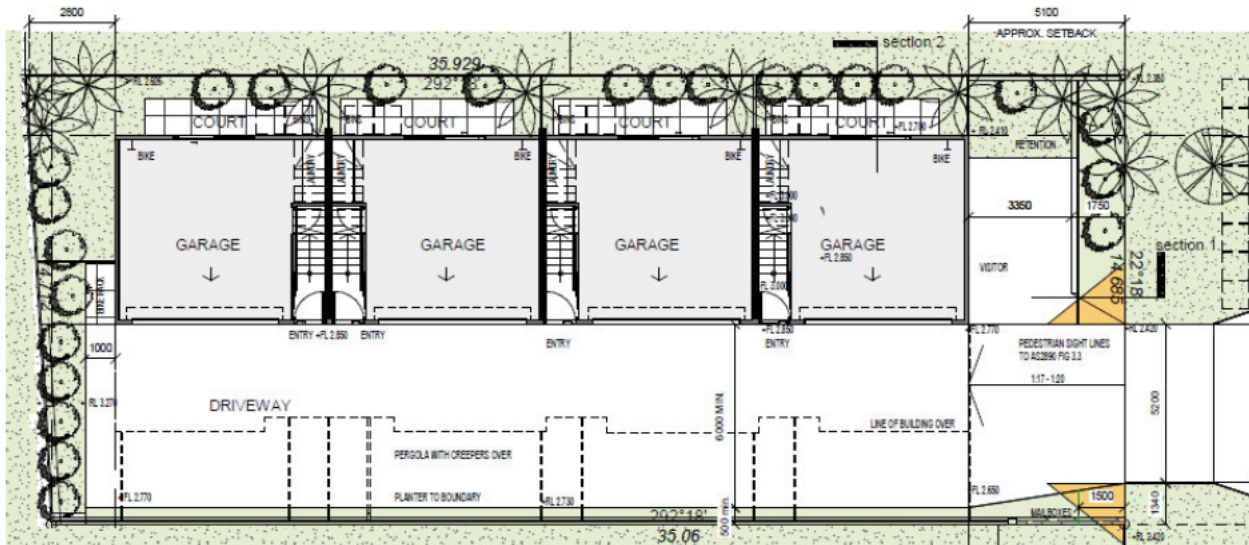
Example Ground Level Site Plan of Townhouse (Orientated to Driveway on Side Boundary)
